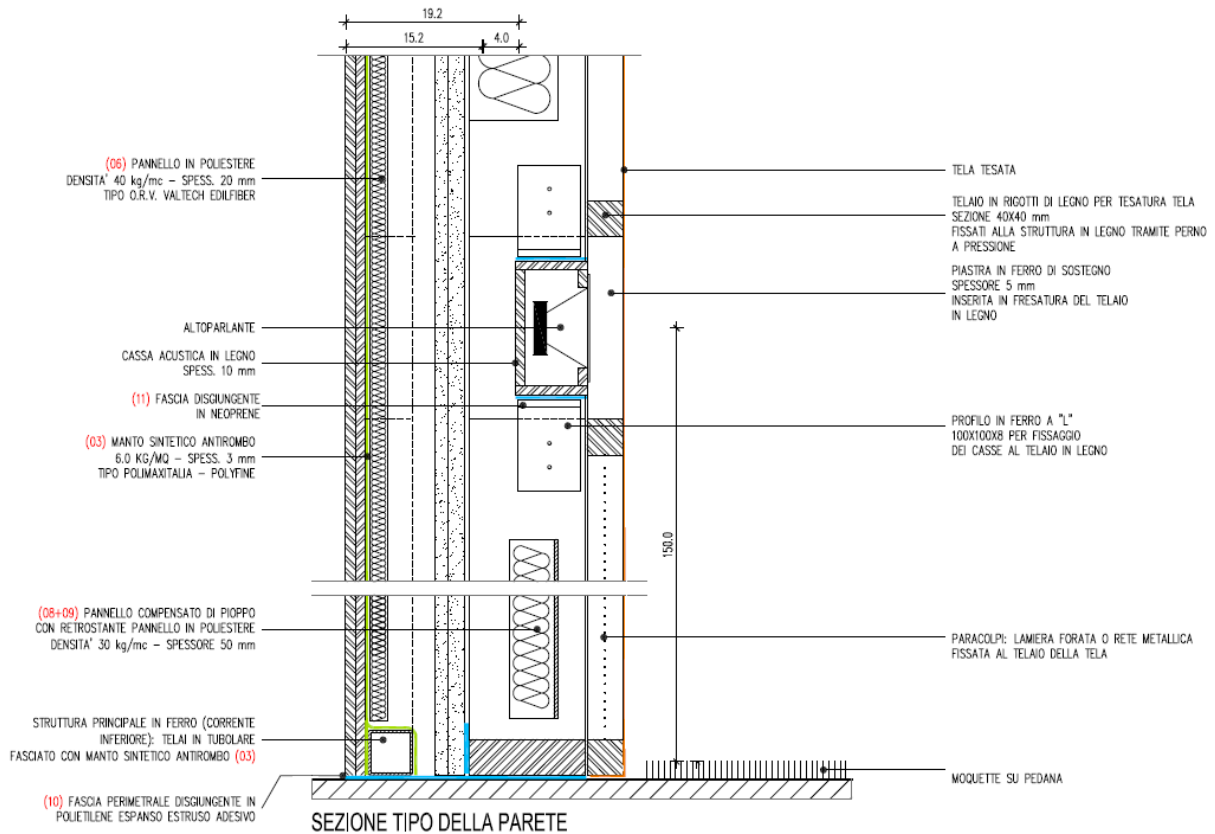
structural details of the wall of the WFS room with embedded loudspeakers
